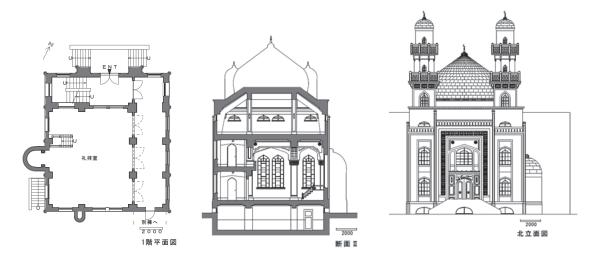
Plan (G/F), Cross Section and Front Elevation (2012)
